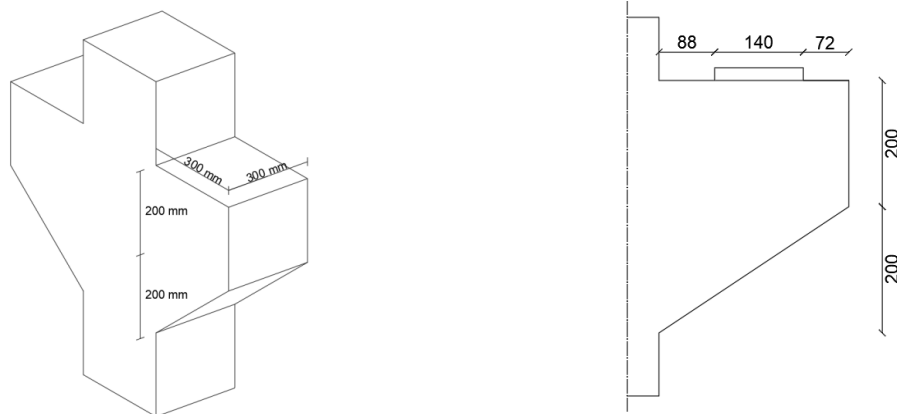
Dimensions of the corbel, dimensions in mm.
